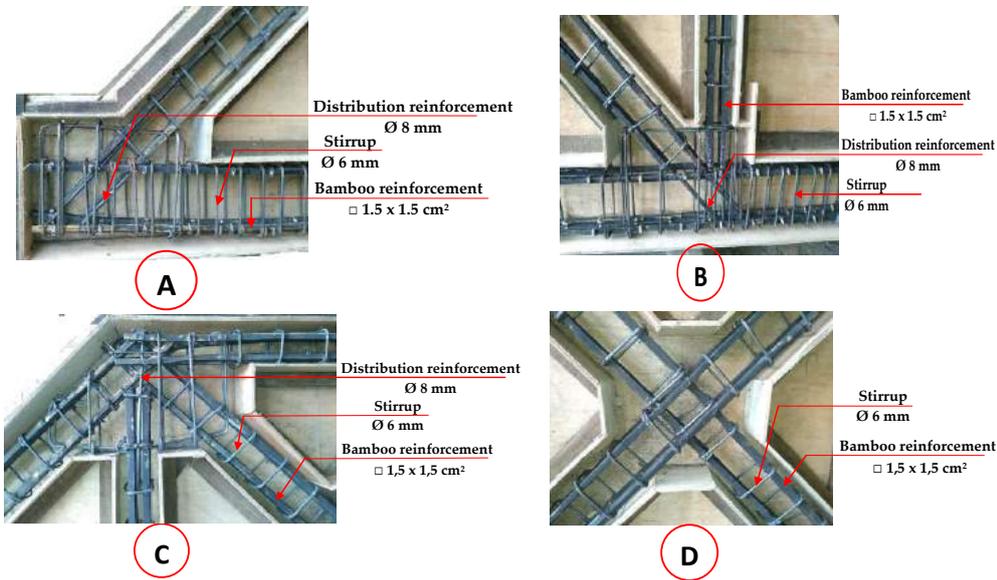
Details of the knot reinforcement for the bridge frames [23].
